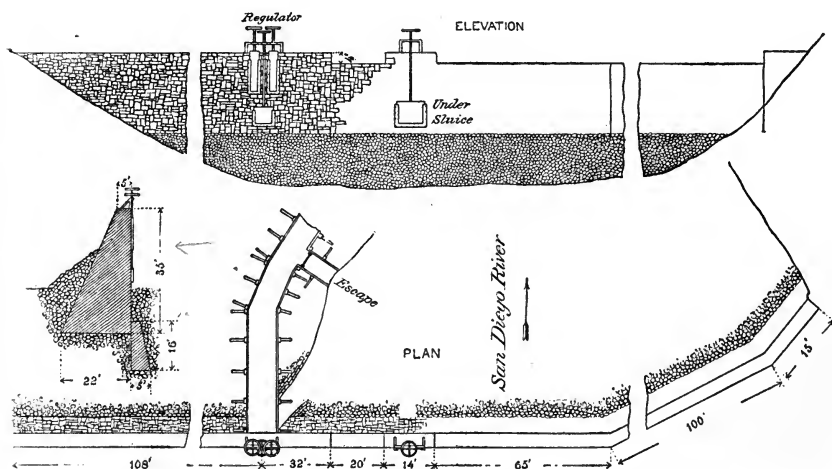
PLAN, ELEVATION, AND CROSS-SECTION OF SAN DIEGO WEIR.
